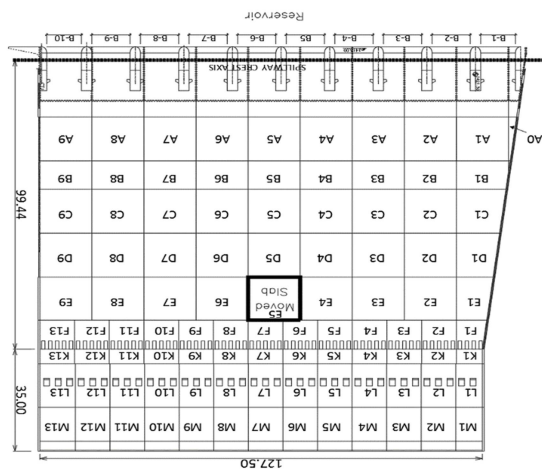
Location of concrete panel excavated from the spillway floor after the flood occurred in 2019
